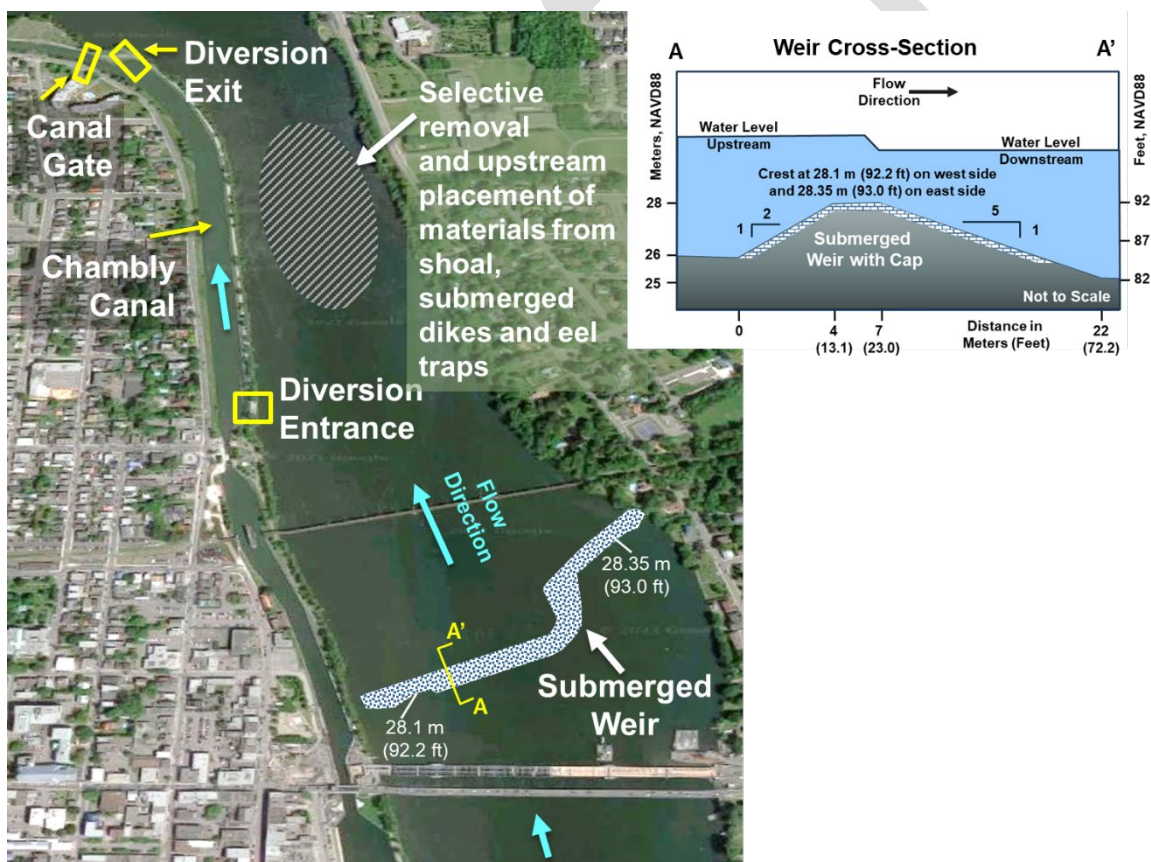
Schematic diagram of proposed excavation, weir construction and diversion through Chambly Canal at Saint-Jean-sur-Richelieu shoal
